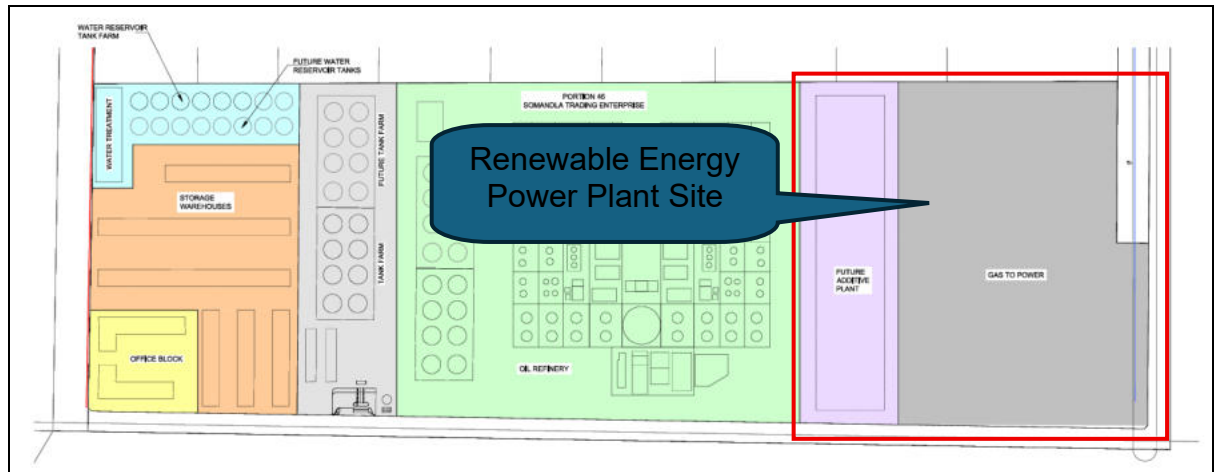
Layout Plan of site (obtained from Seal Consulting Engineers)
